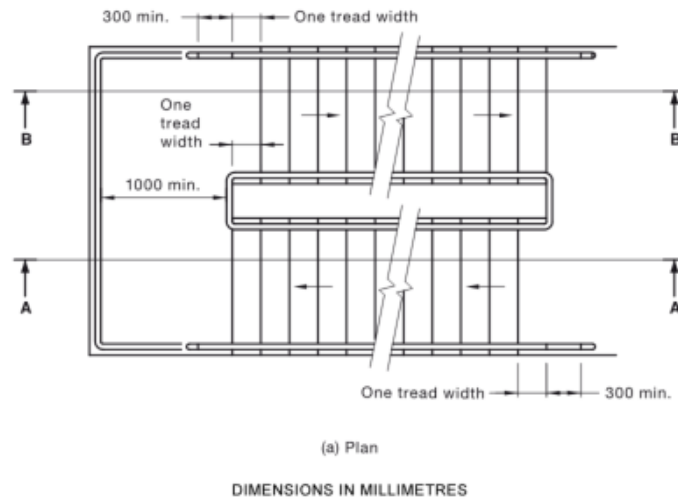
(in part) HANDRAILS TO STAIRS WITH INTERMEDIATE LANDINGS
